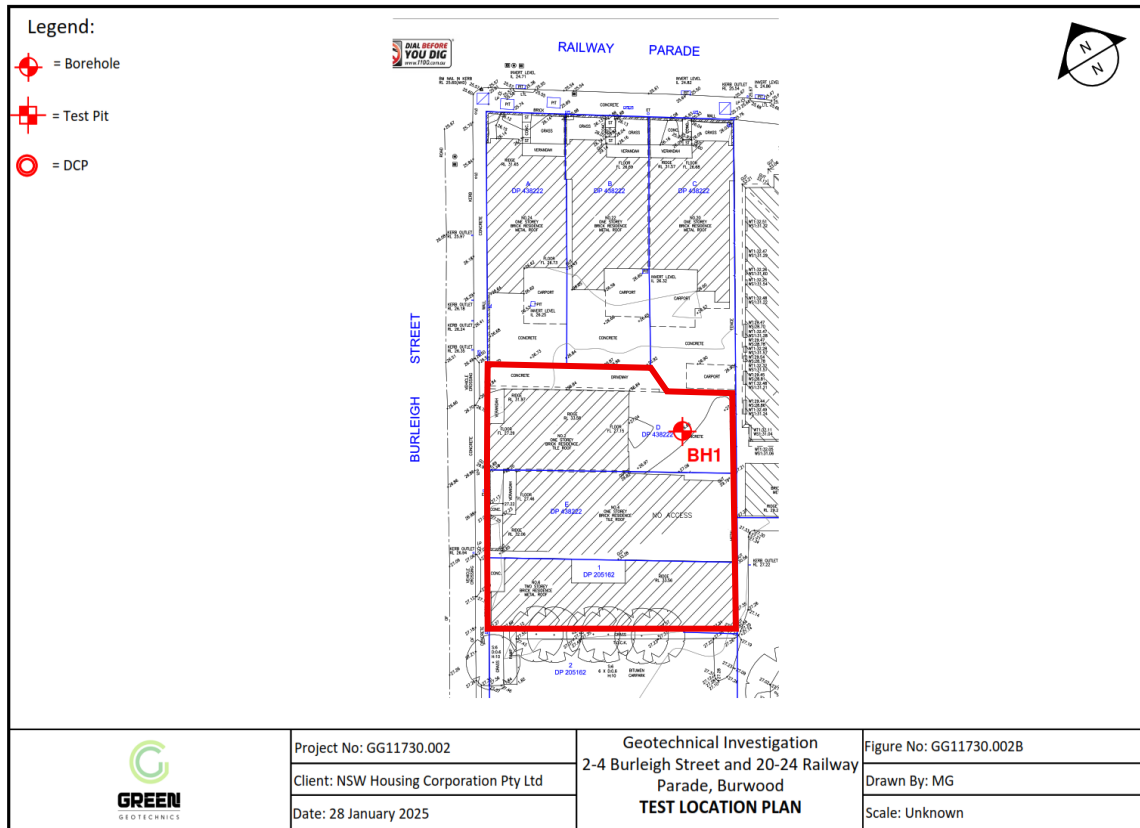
Geotechnical test location plan showing borehole in rear yard of 2 Burleigh Street. (Source: Green Geotechnics, Final Report January 2025)
